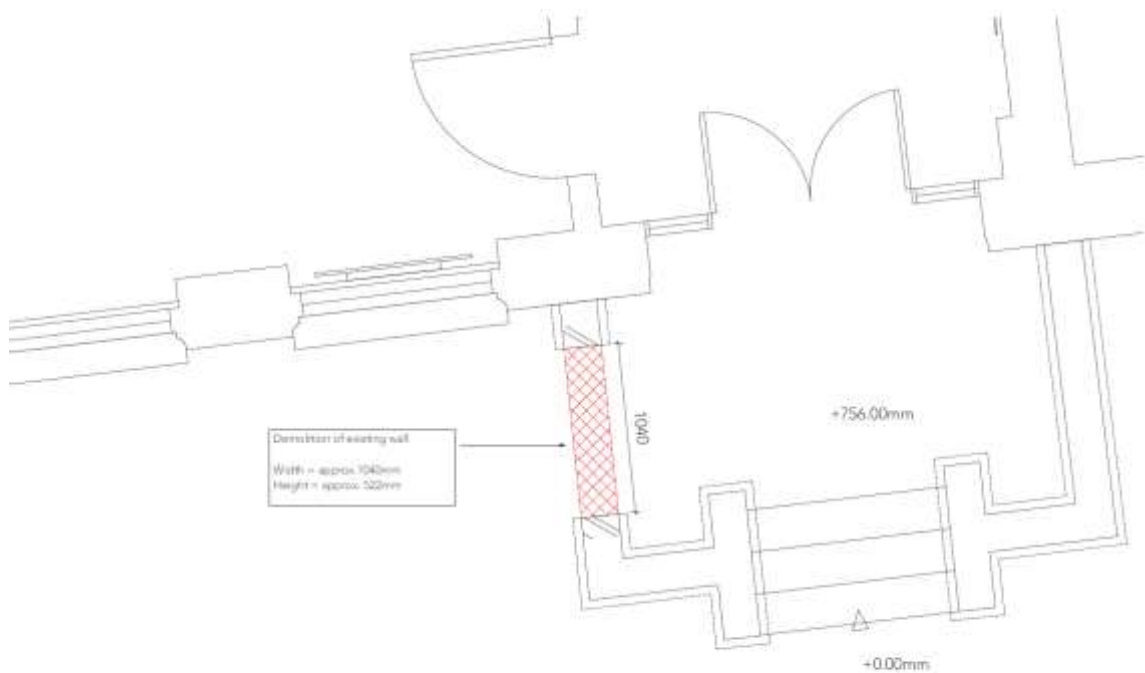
Proposed demolition plan indicating the modest amount of material proposed for removal. The drawing also indicates the existing arrangement of the proposal site. Refer architects' full drawing set..
